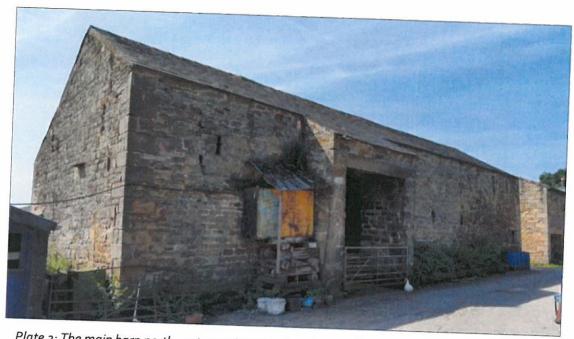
The main barn north east overview showing stone walled, open windows and doorways.
